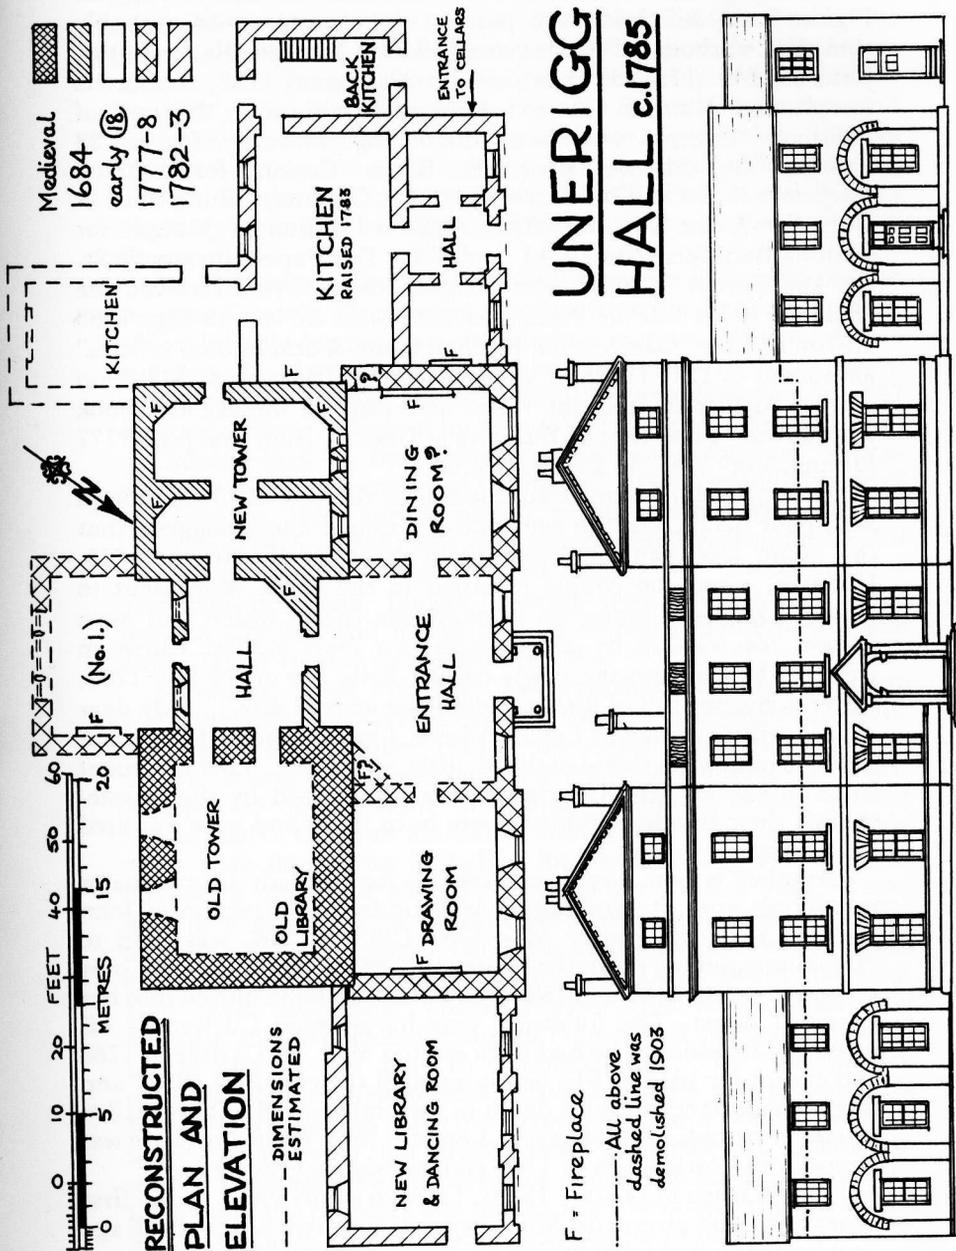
Reconstructed Plan and Elevation of Unerigg Hall c.1785.
